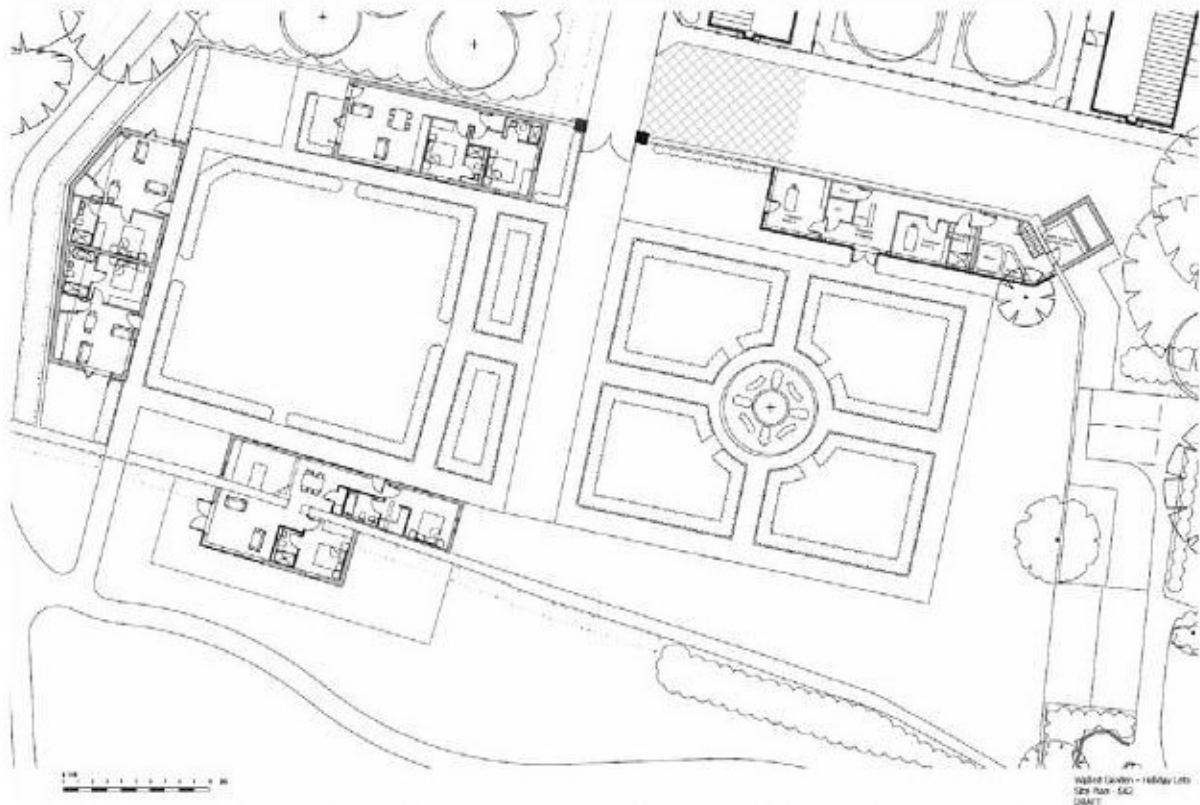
First revised Site plan with parterres, and new unit to old wall removed
